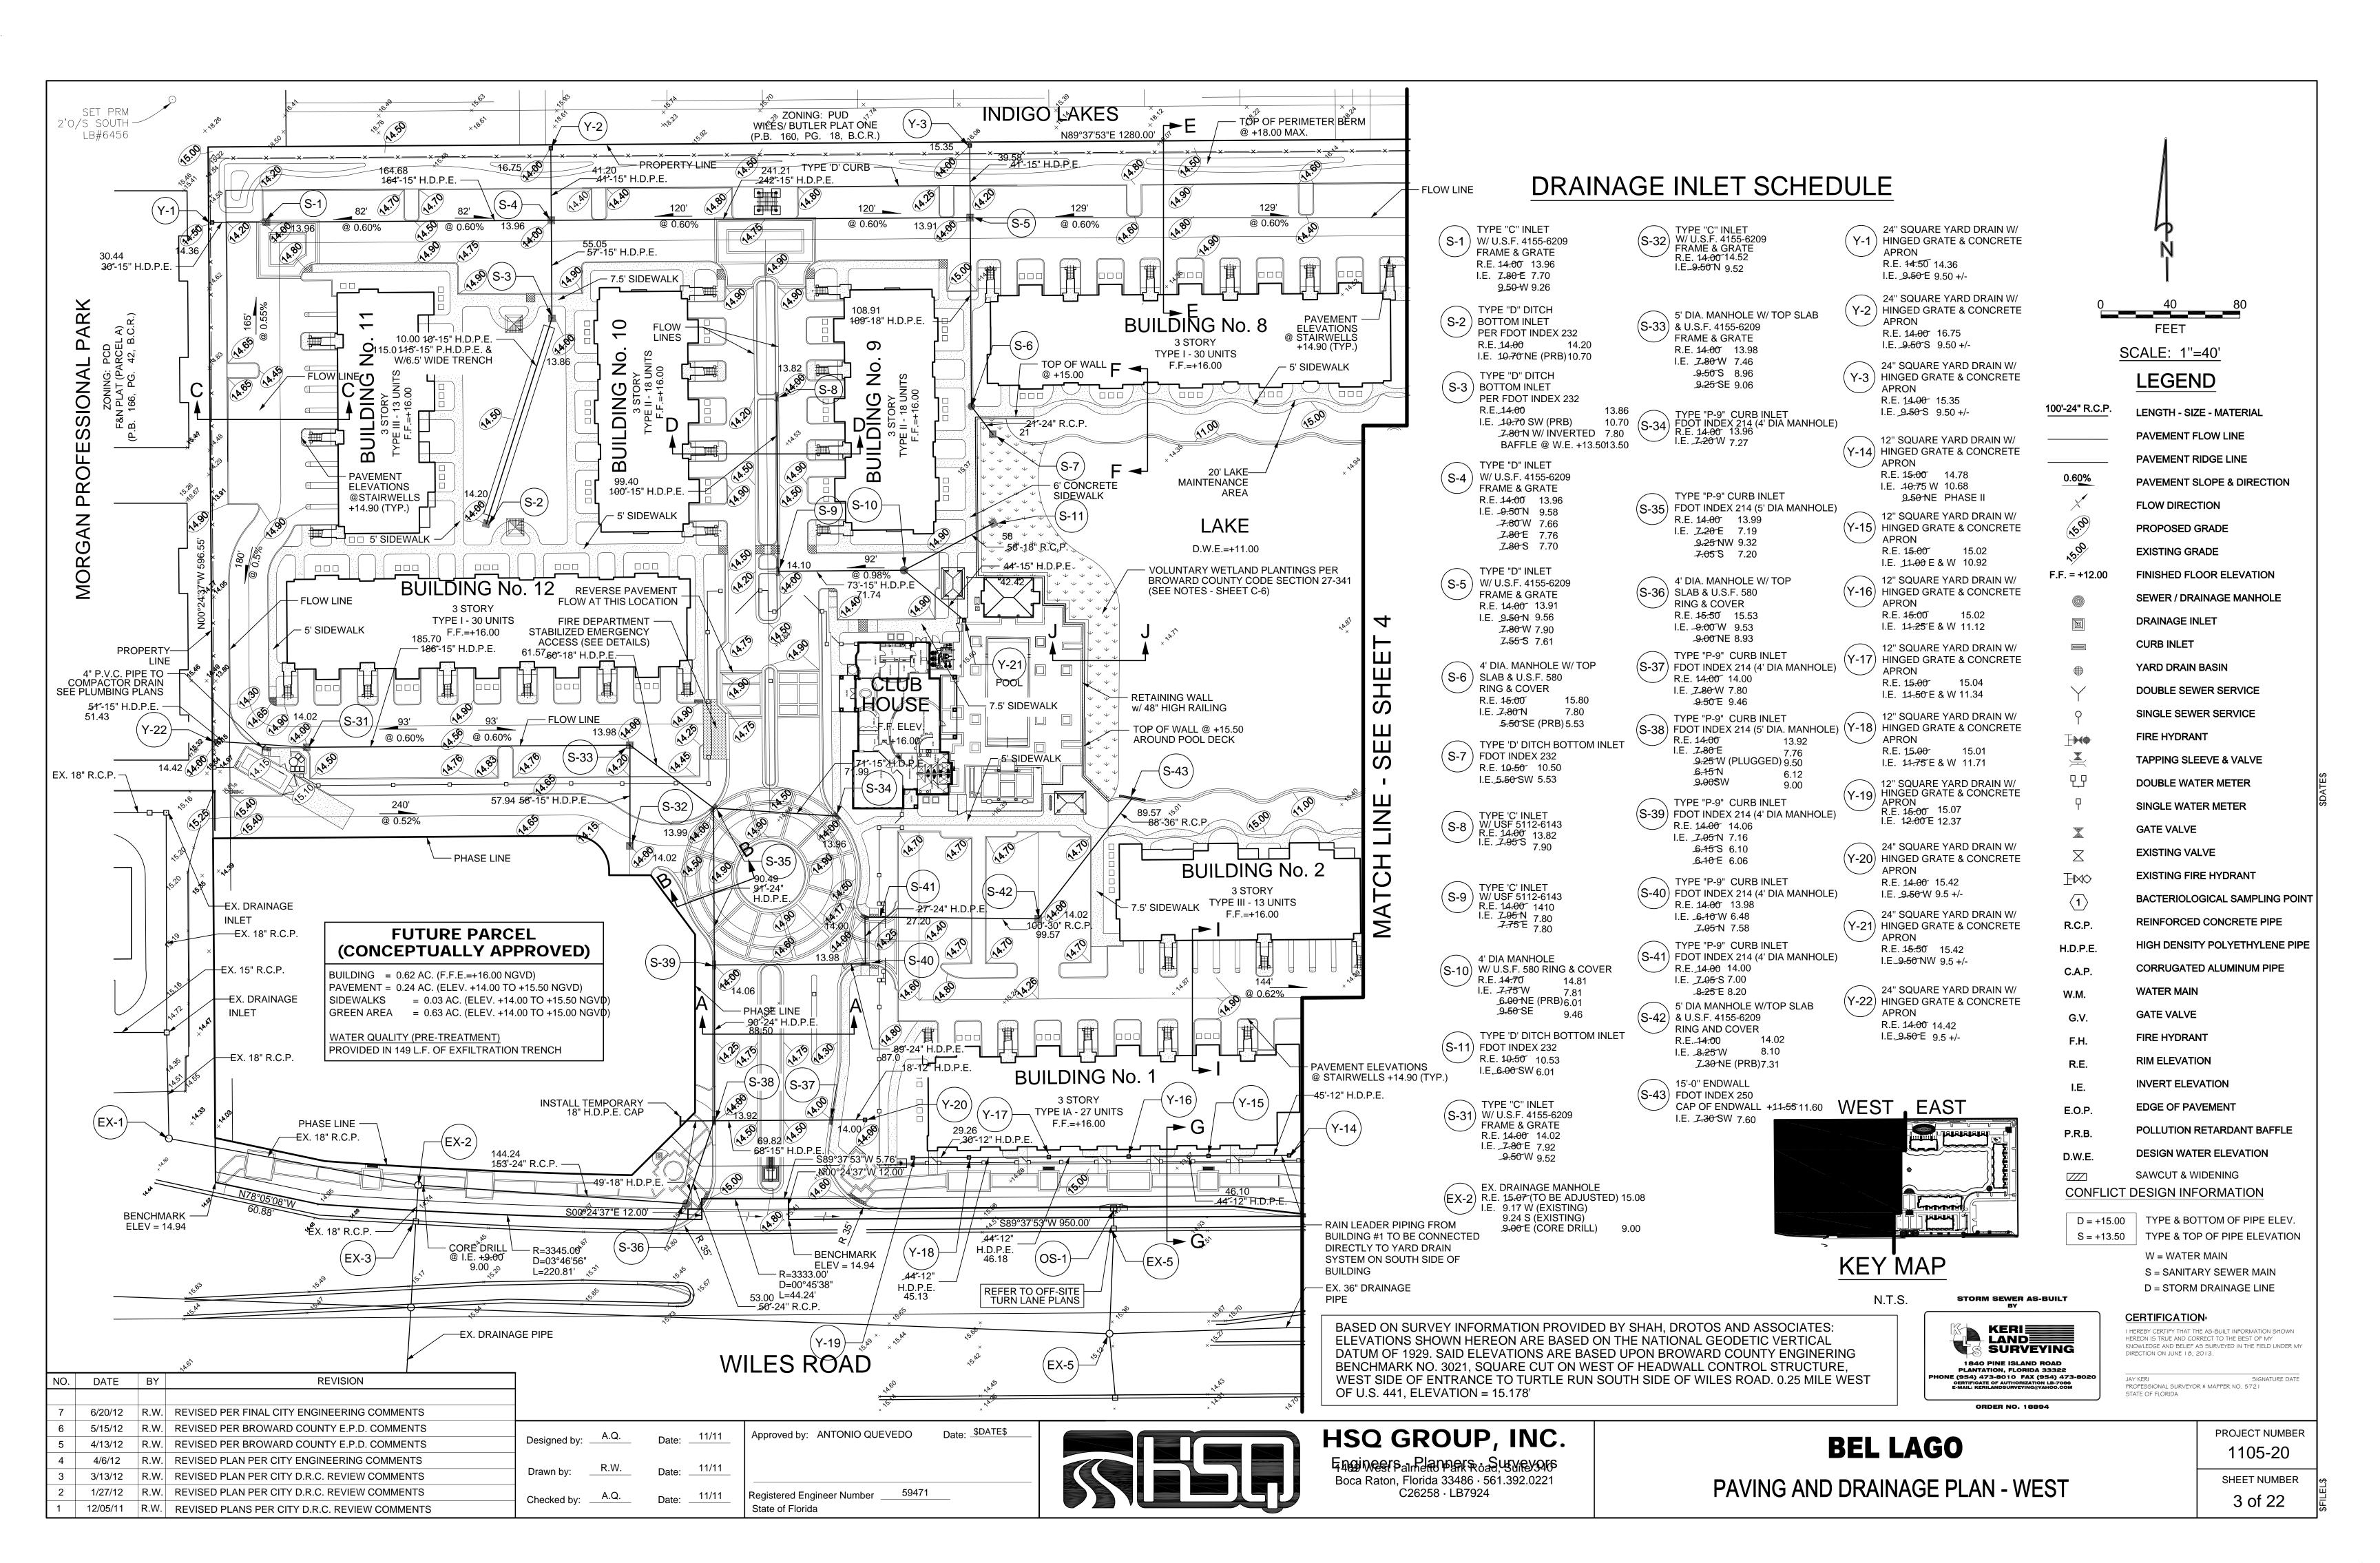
CIVIL AS-BUILT DRAWINGS
